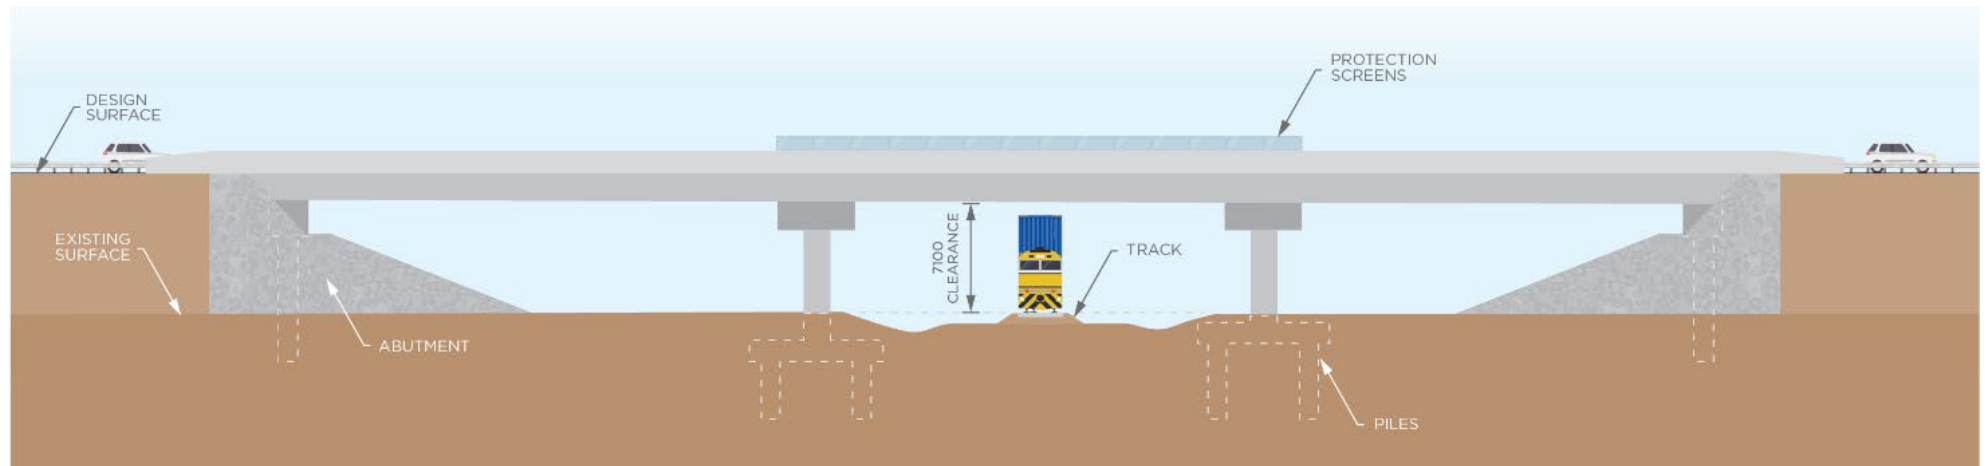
TYPICAL SECTION OF ROAD-OVER-RAIL BRIDGE STRUCTURE
